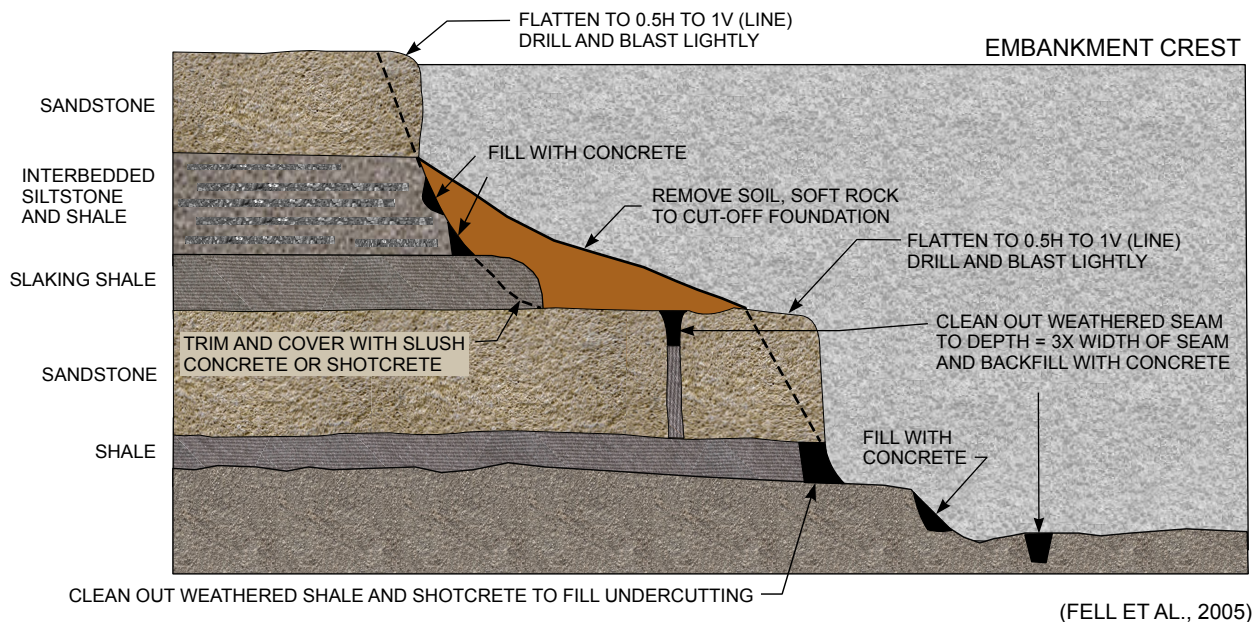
SLOPE MODIFICATION TO REDUCE DIFFERENTIAL SETTLEMENT AND POTENTIAL FOR CRACKING
